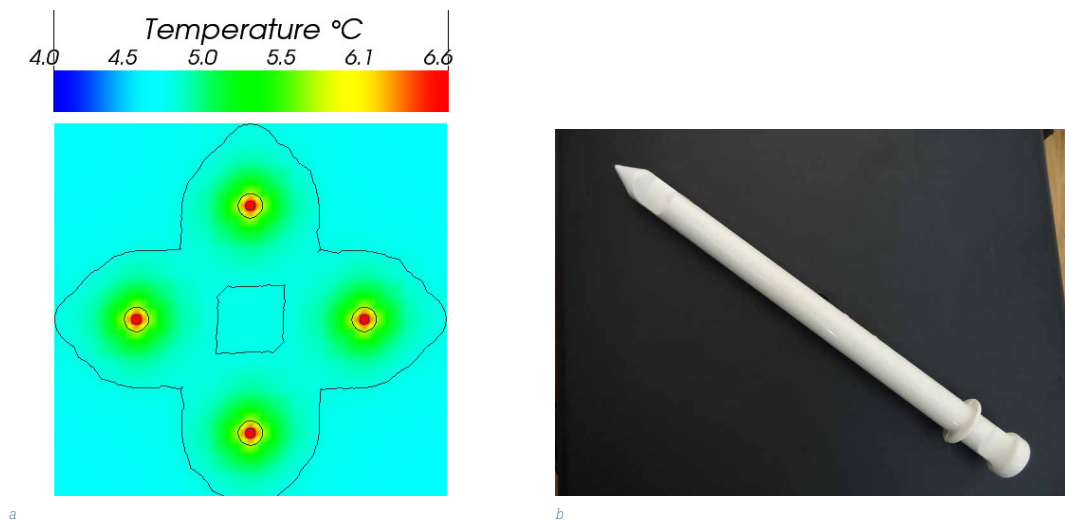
Girders: a) point thermal bridges caused by metal girders; b) polymer girder
